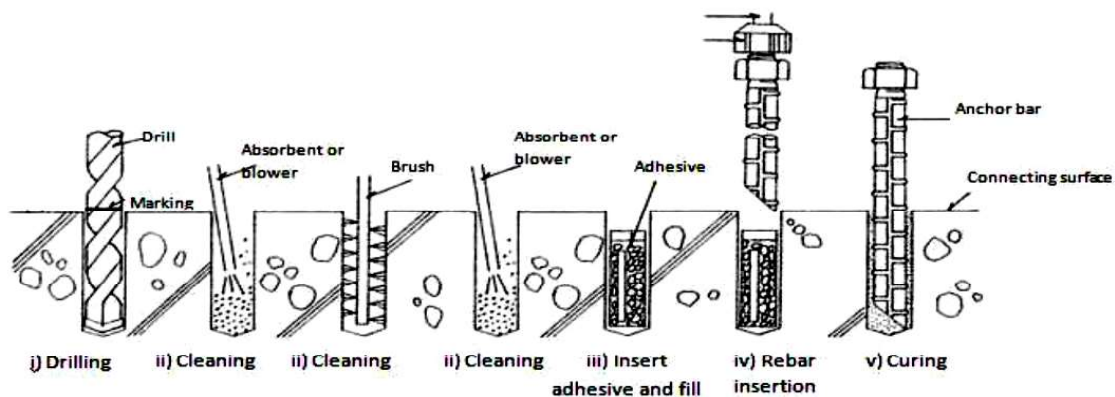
Step by step Procedure for Post Installed Anchor Work
